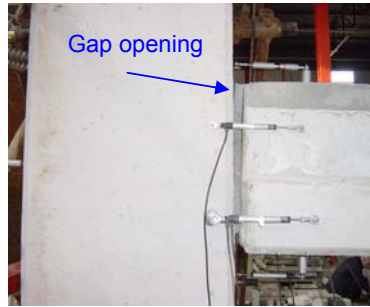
Brooklyn suspended solution: gap opening at beam-column interface well-beyond service load level (right)
